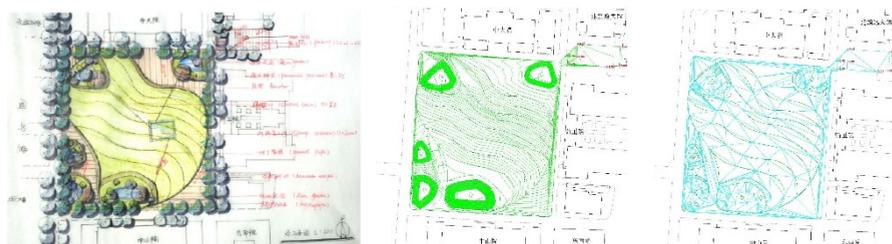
Left: Draft design of the site. Middle: Contour plan. Right: TIN plan.
